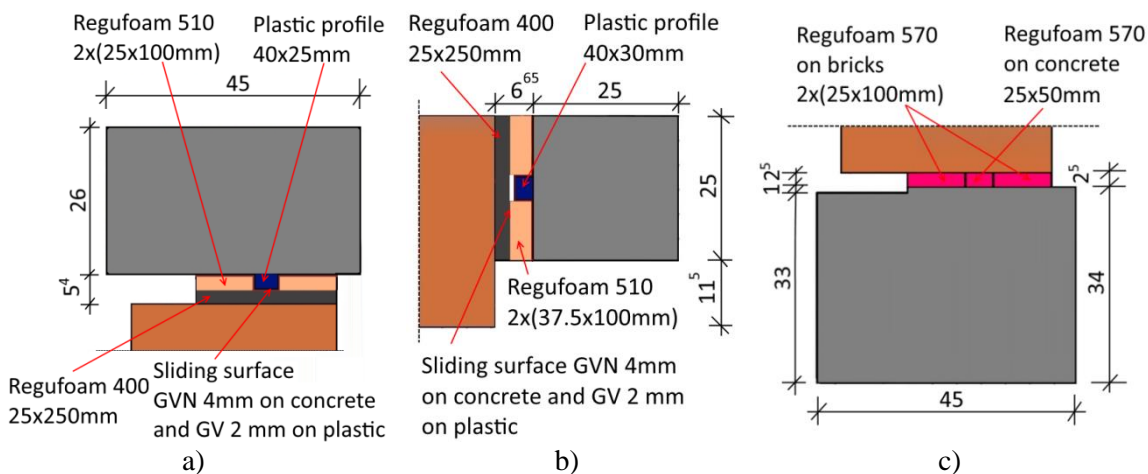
Details of the INODIS system used for the DIO test: a) top beam connection, b) column connection and c) bottom beam connection
